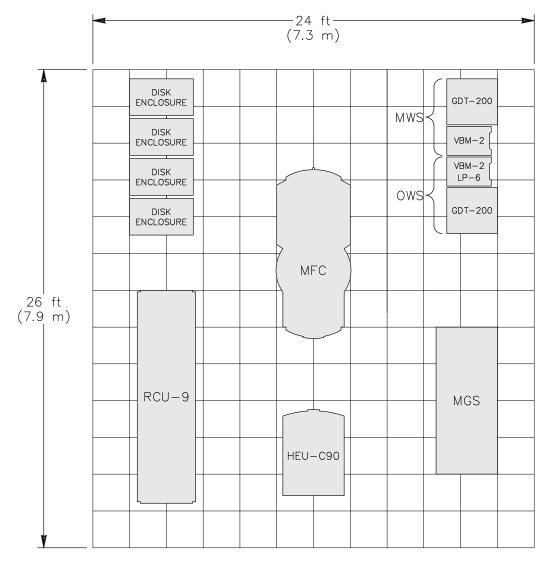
CRAY C94 and CRAY D94 Typical Floor Plan
